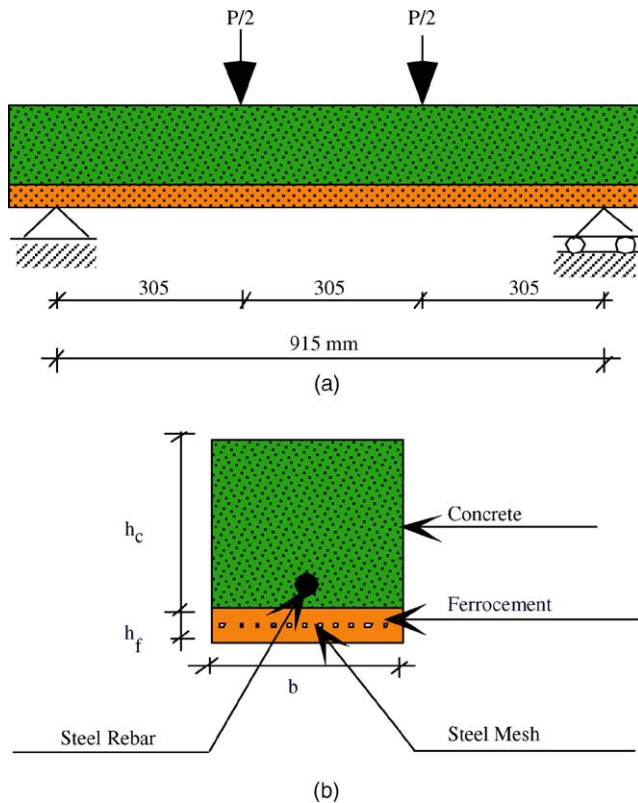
Typical beam elevation and cross-section considered in this study. (a) Longitudinal view and (b) beam cross-section.
